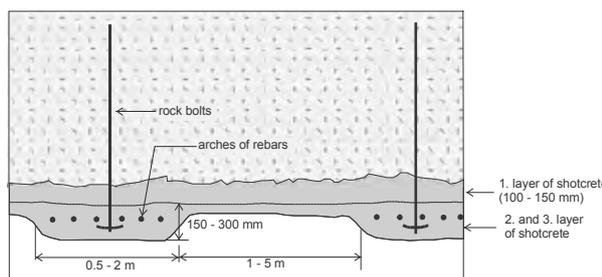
Typical design of shotcrete ribs used at Frøya and other Norwegian sub sea tunnels.
